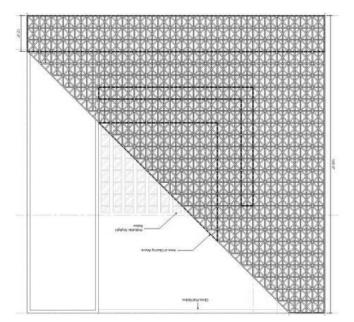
Plan view showing the top bottom grids with the diagonal connections.¹⁴⁹
